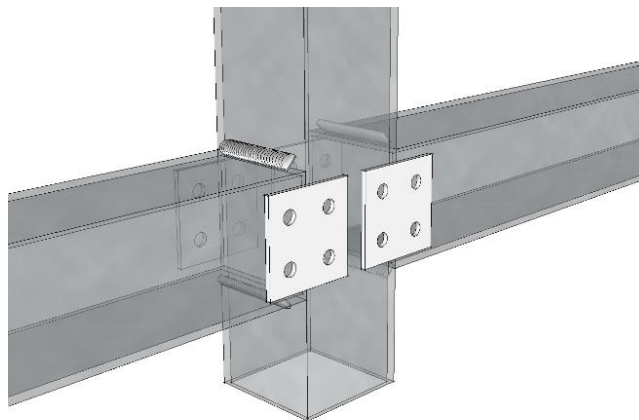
Design of Specimen A1: fully welded beam-to-column connection
